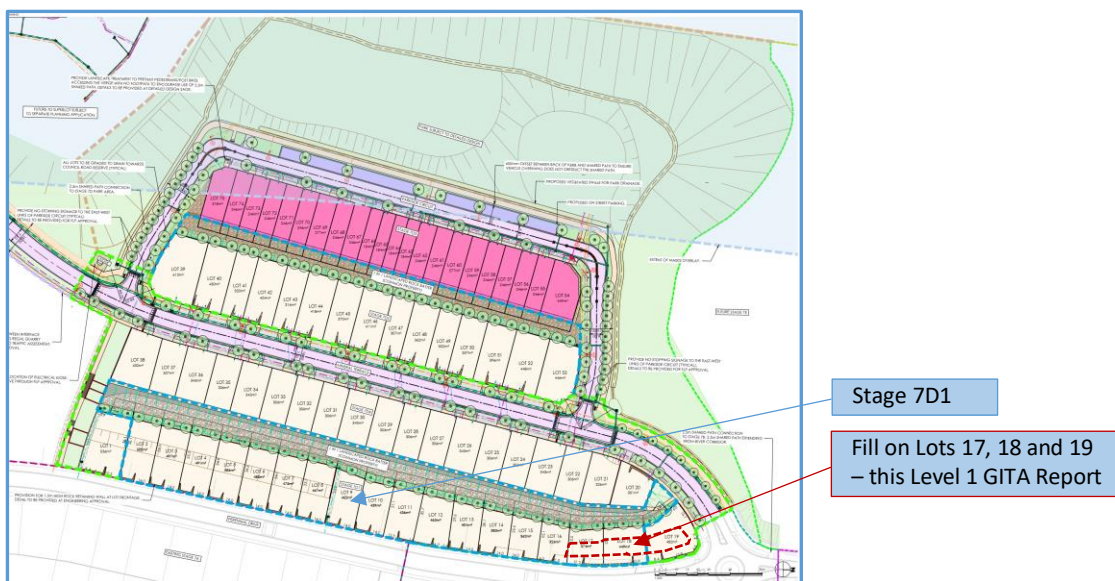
Stage 7D – extract from CJ Arms drawing 'Overall Concept Layout Plan'
